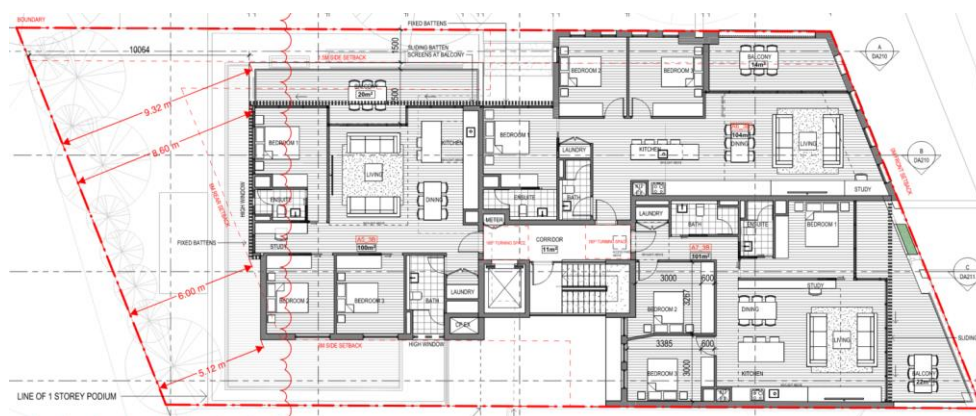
Proposed level 3 floor plan showing side setbacks in red - 18-20A Perouse Road, Randwick
